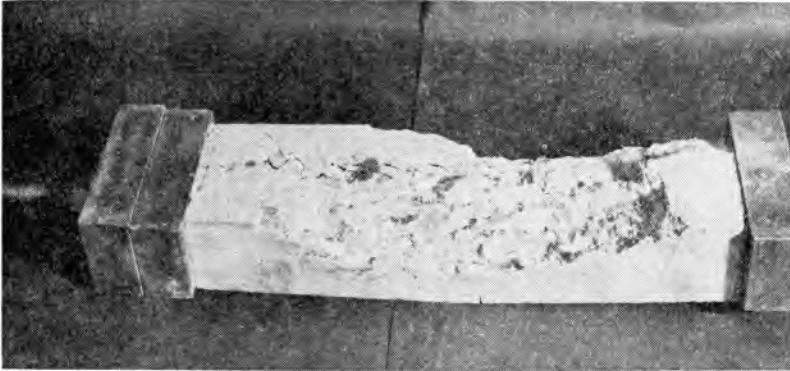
A typical failure of a post-tensioned beam specimen C-3 Series I.
